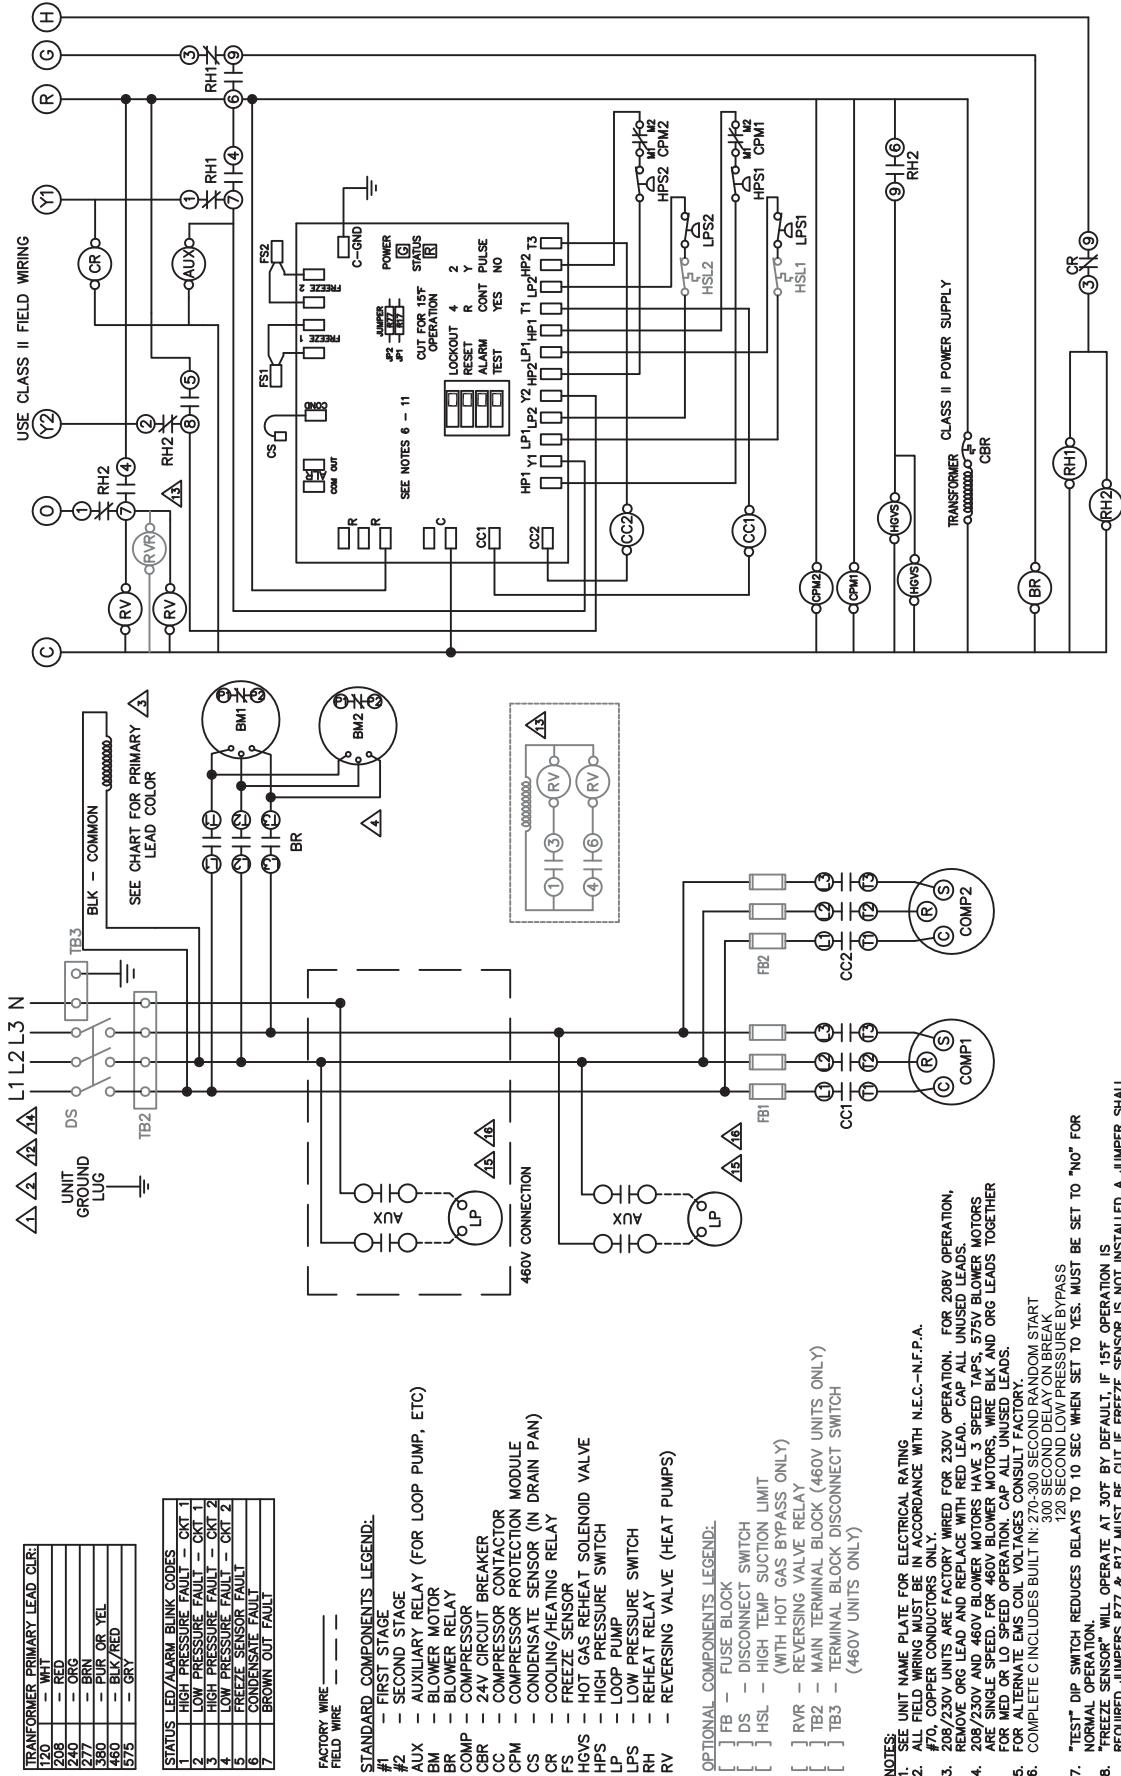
3-Phase Complete C Board with Hot Gas Reheat
